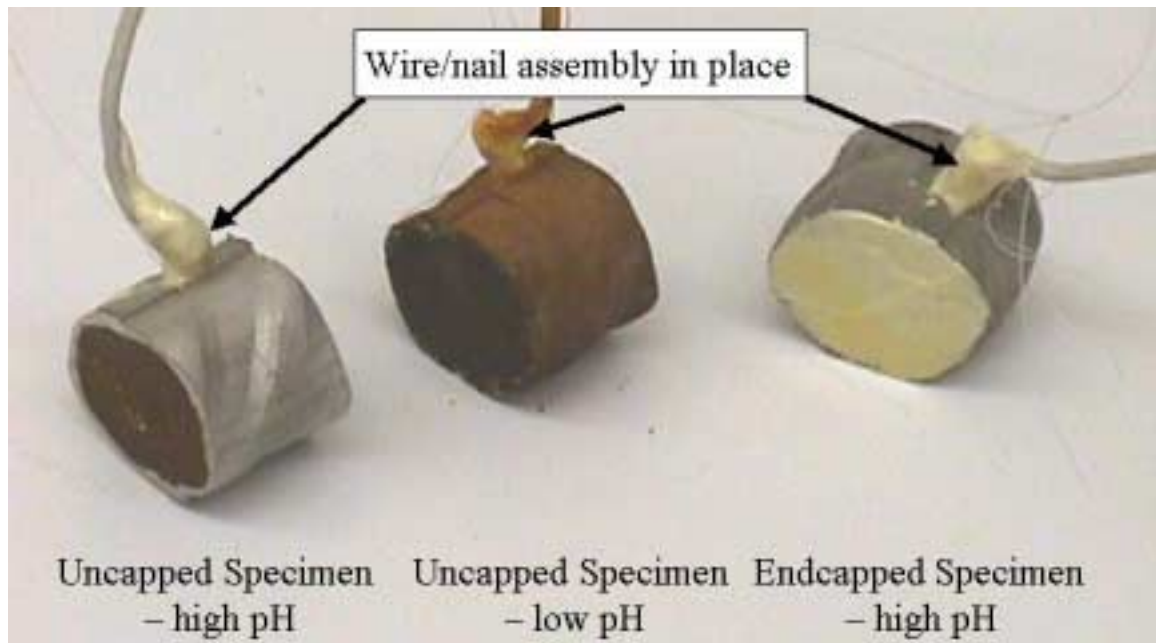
Test Samples of Stainless Steel Clad Rebar with Wire/Nail Assembly in Place
